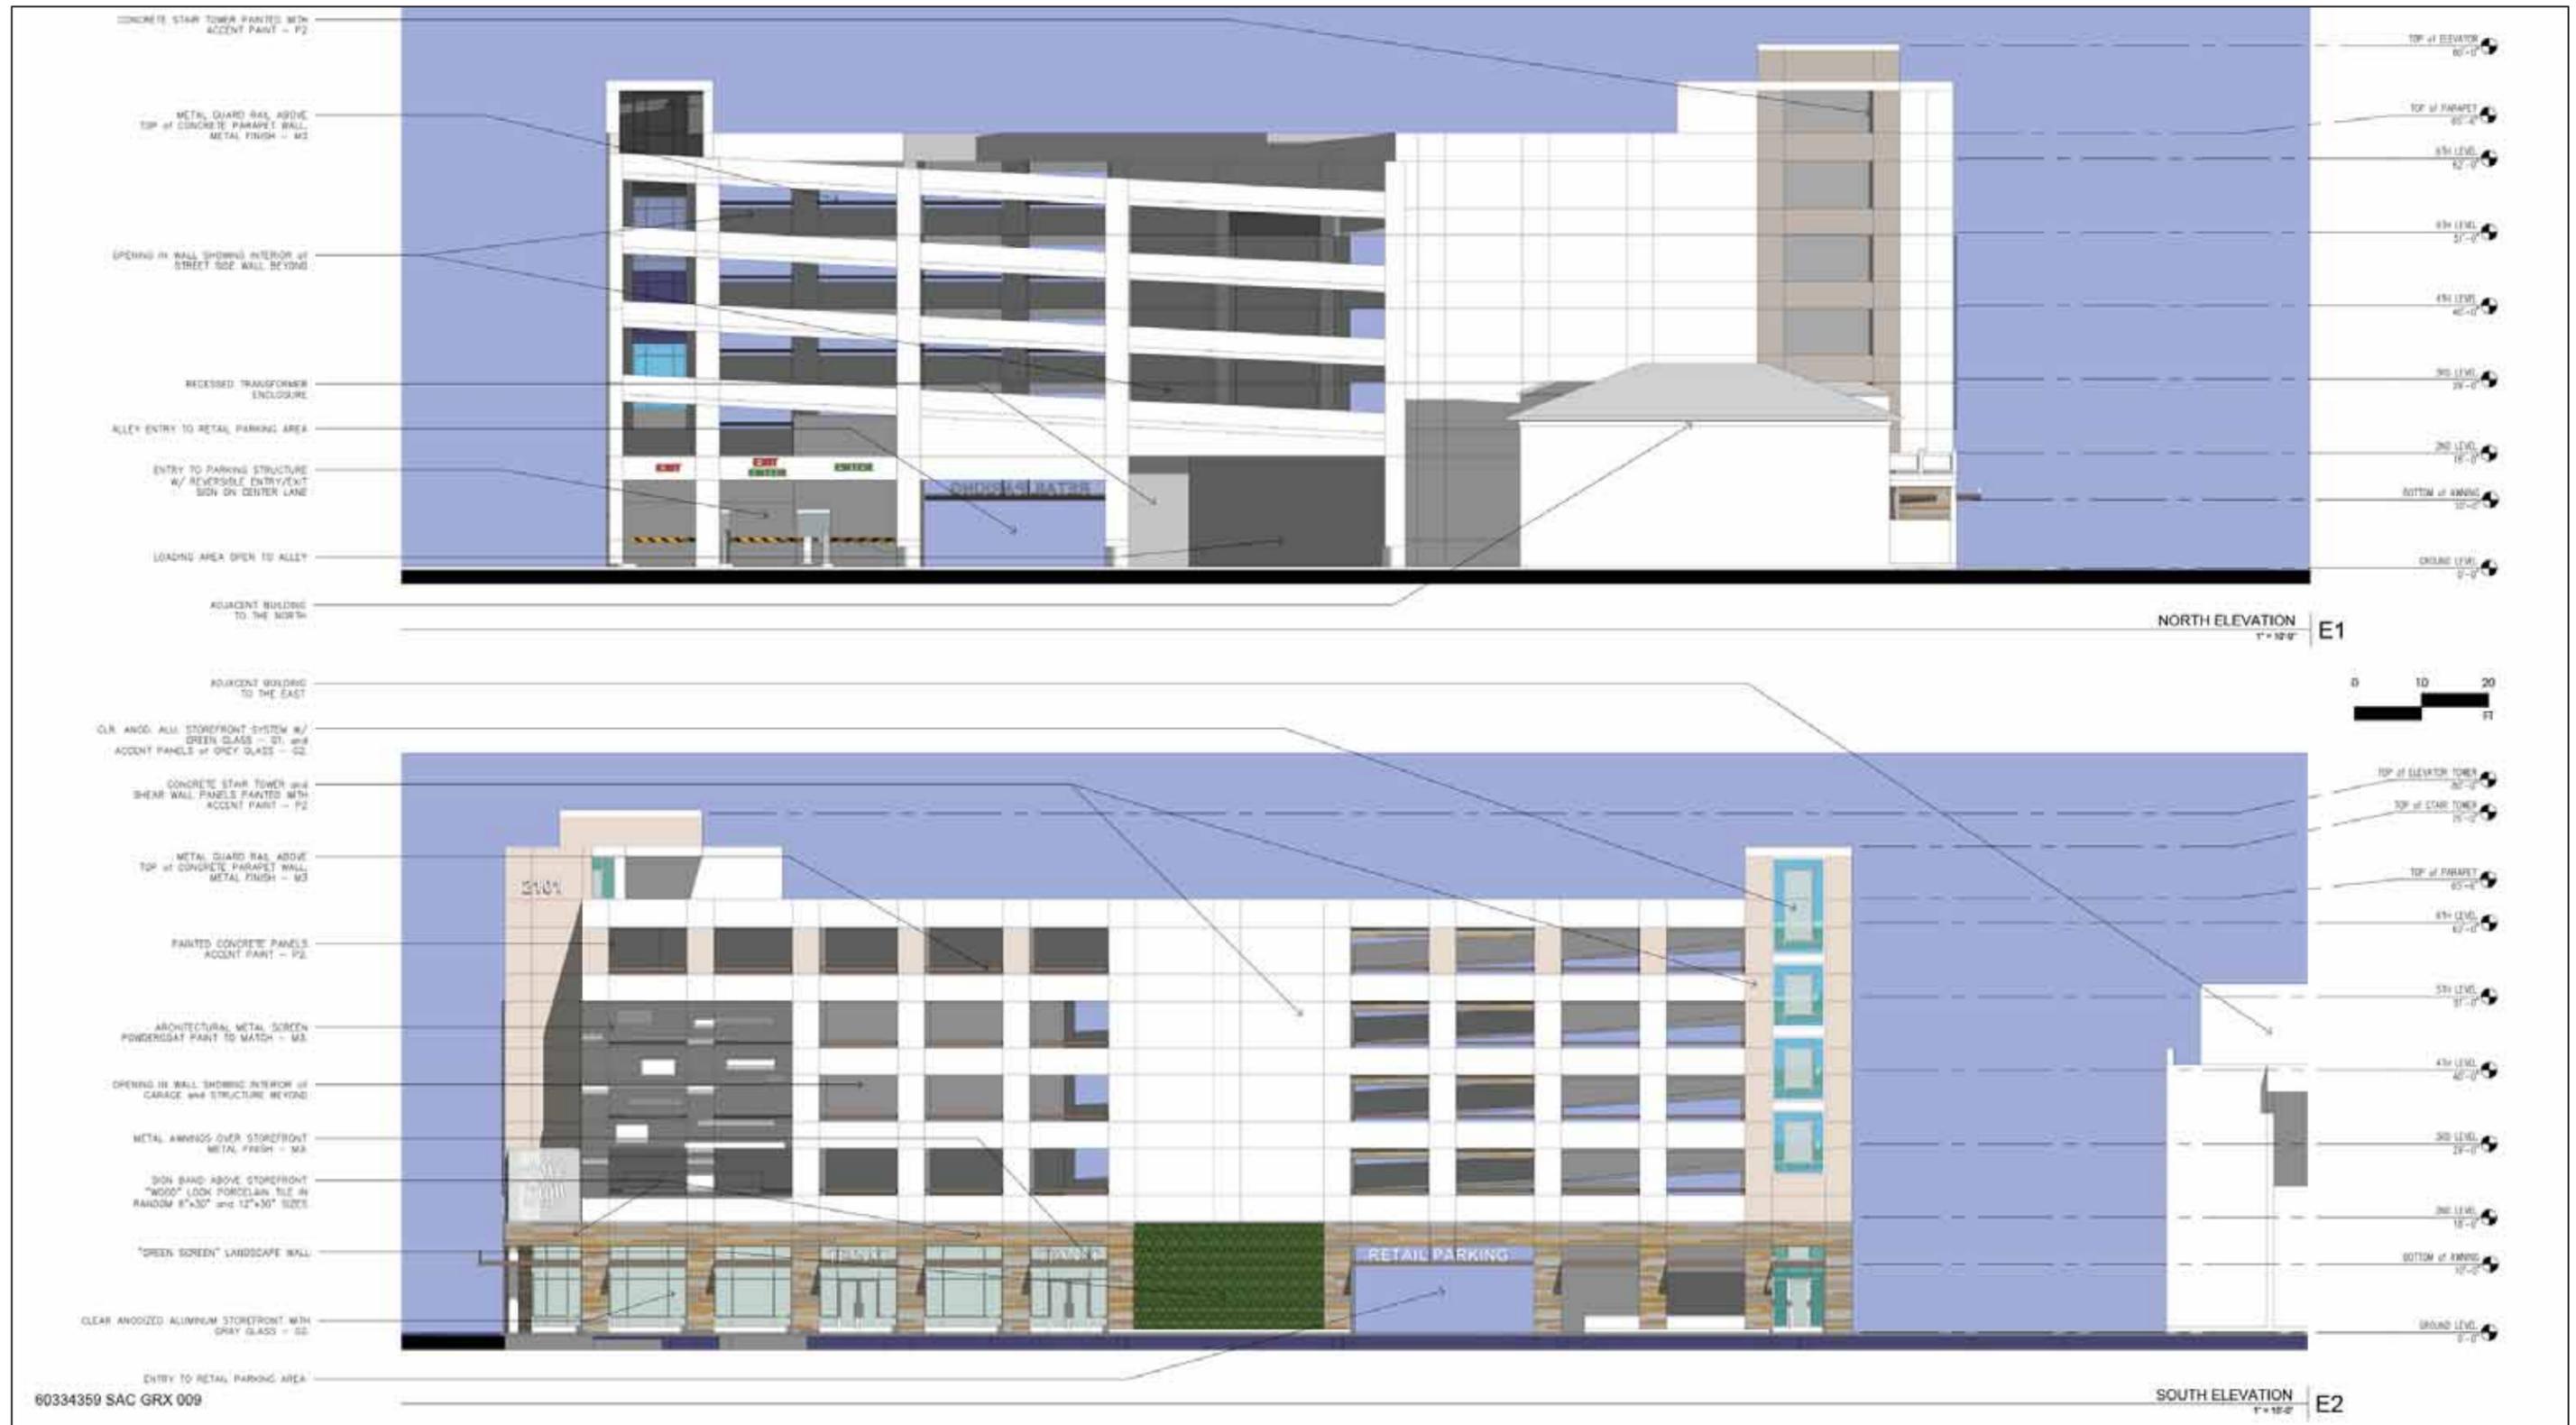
2101 Capitol Avenue Exterior Elevations (from North and from South)
